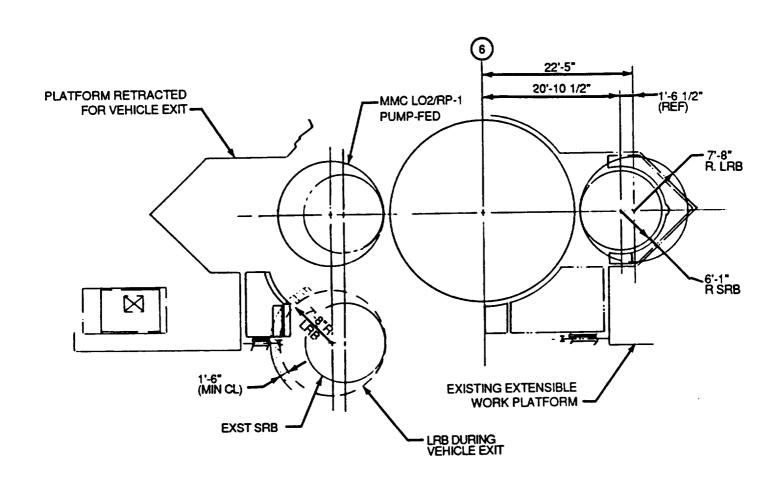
2 Plan View LRB Typical Infringement LO2/RP-1 Pump-Fed (MMC).
